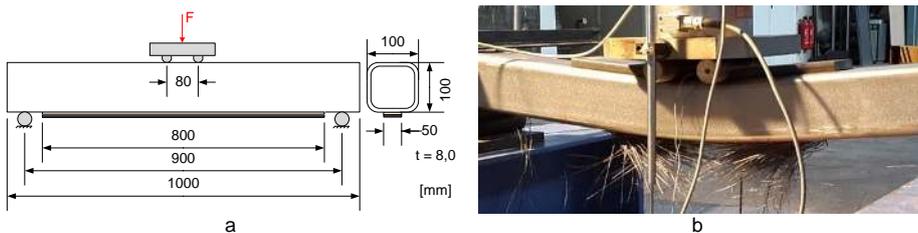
a) Test setup: hybrid reinforcement made of CFRP laminate; b) failure of CFRP laminate during testing
